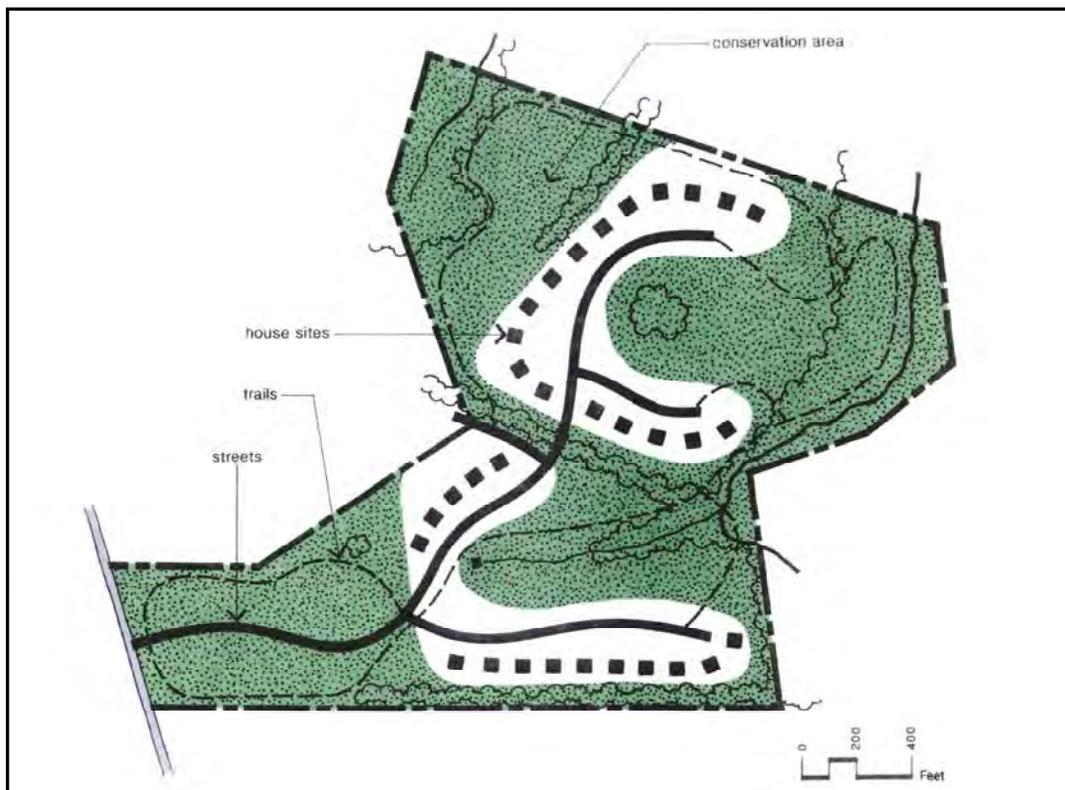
Design Road Alignments and Trails (Source: Arendt, Randall)
